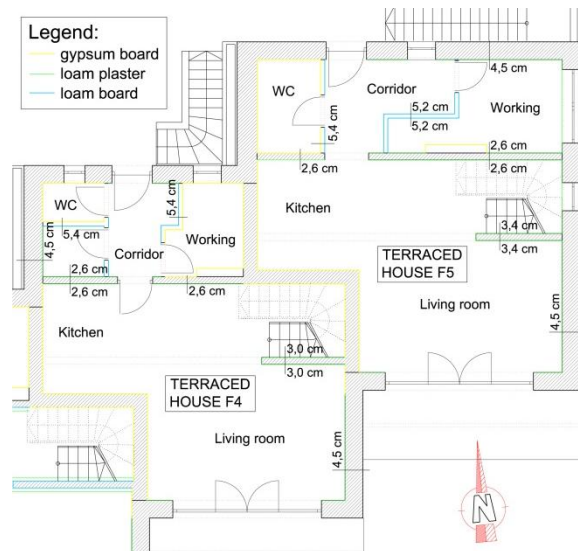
Ground floor of terraced house F5 and F4 with thickness of loam layer
